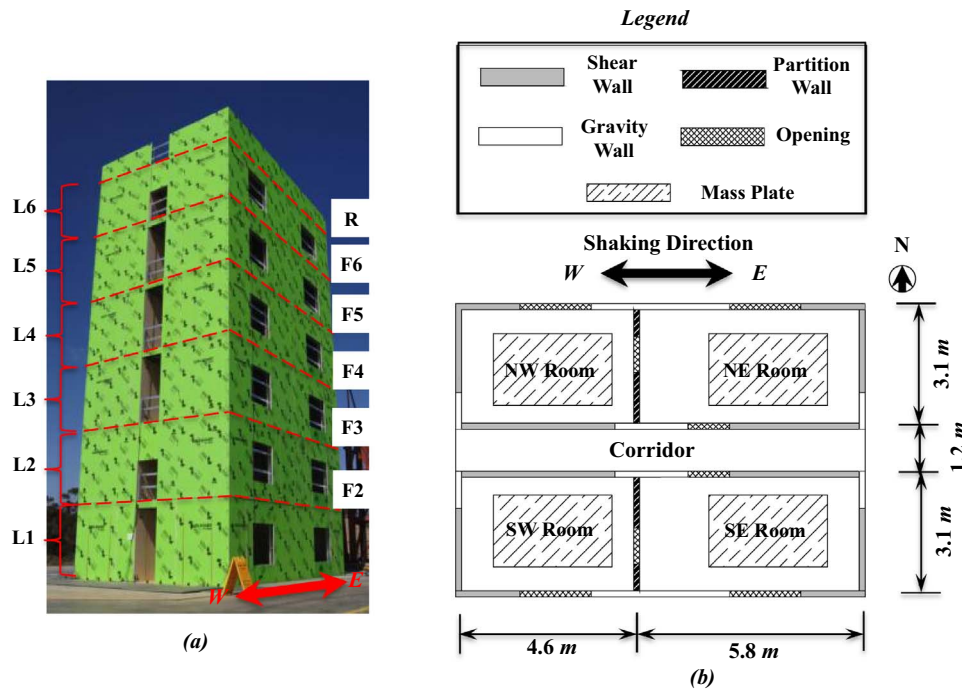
Cold-formed steel framed building at the LHOST facility: (a) Photograph of the building on the shake table (looking at south west corner); (b) Typical floor plan (after [2]).
